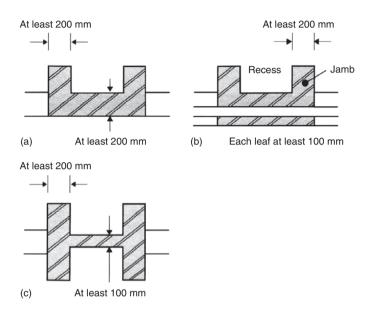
Fireplace recesses. (a) Solid wall. (b) Cavity wall. (c) Backto-back (within the same dwelling)
